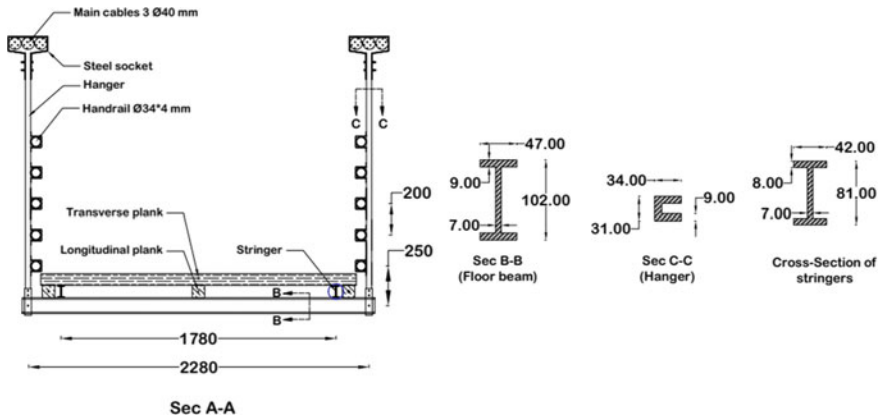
Cross section and dimensions of the footbridge structural elements (in mm)
